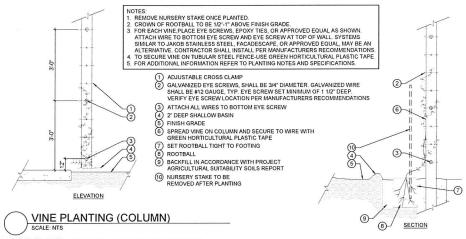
| VINE PLANTING (COLUMN)
